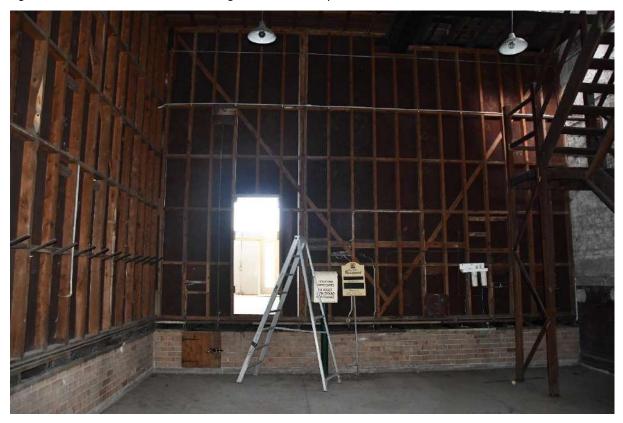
The Pumphouse Lower room (Room #04) looking south. The floor level in this room is lower than the adjoining rooms and it features exposed wood stud work and various Power Station features.
